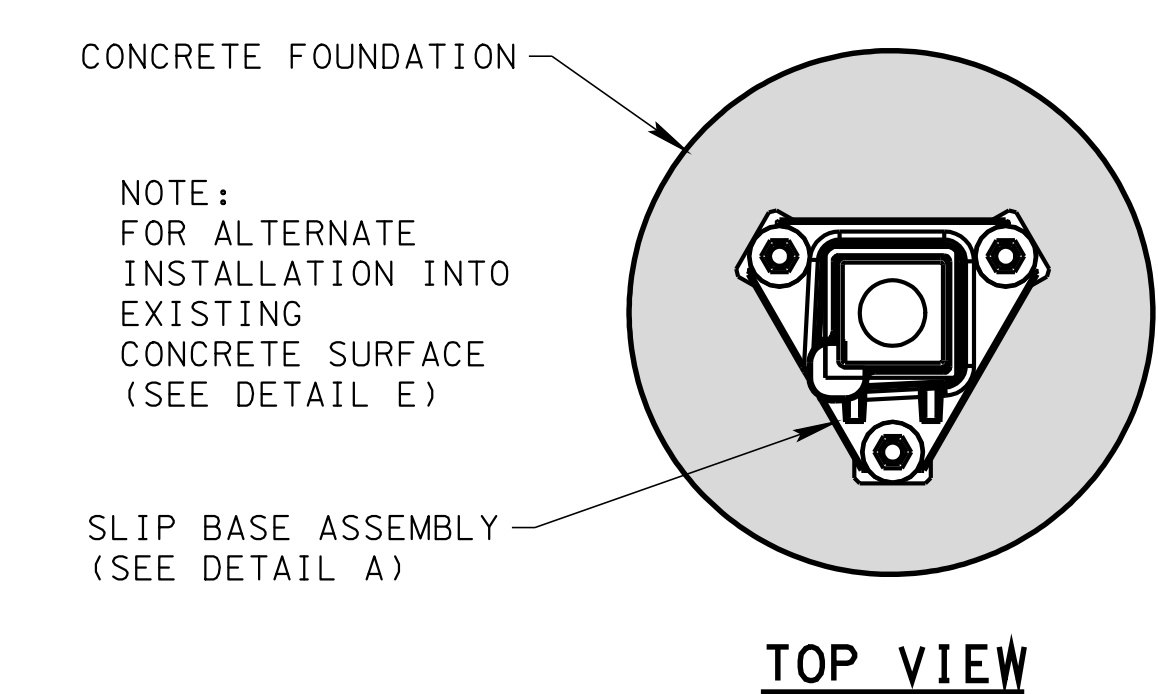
DETAILS FOR SIGNS MOUNTS ON CONCRETE MEDIAN BARRIERS
